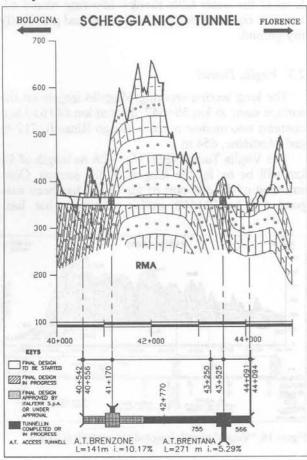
"Scheggianico" tunnel: longitudinal geological section.
